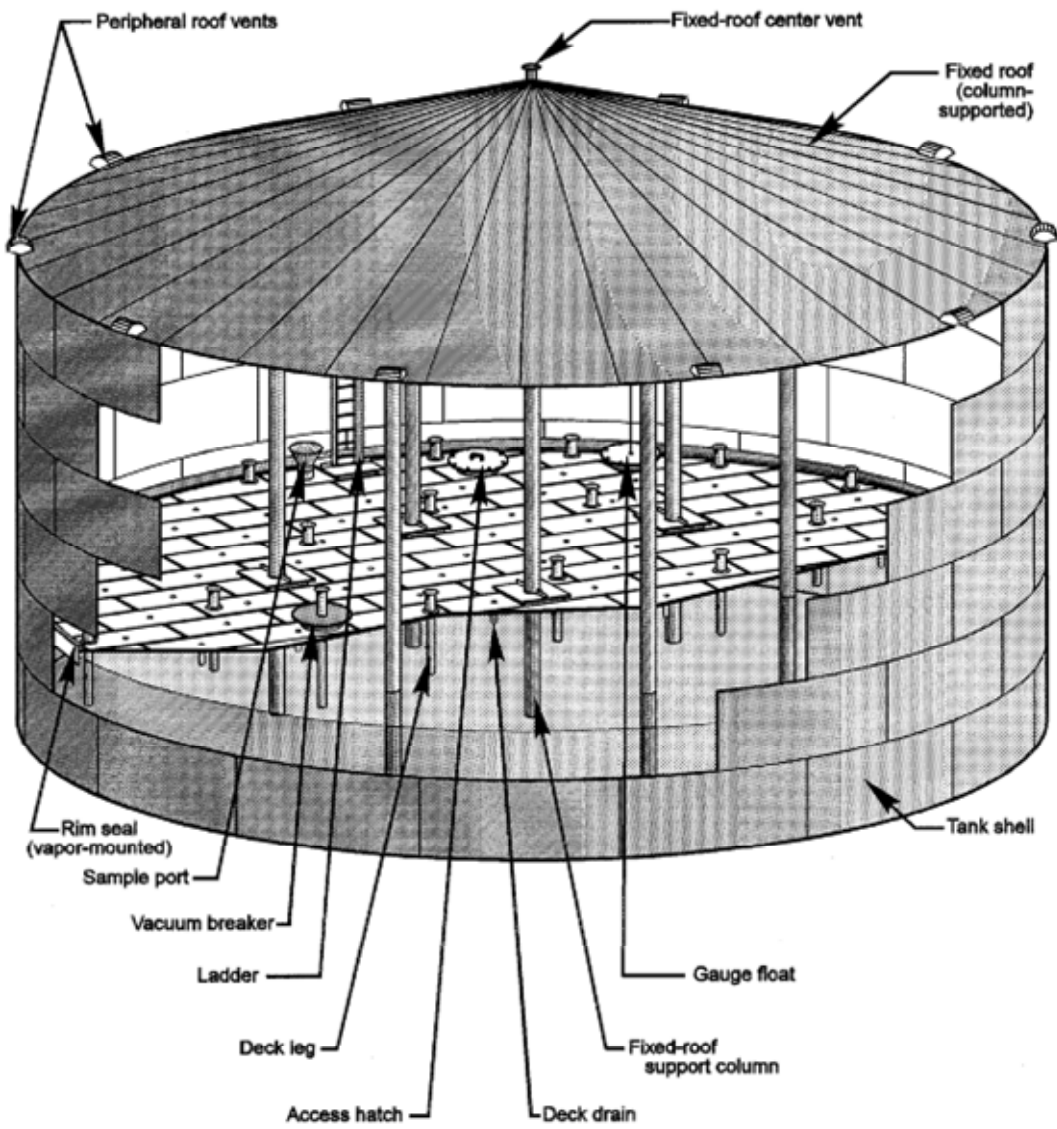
Internal floating roof tank.<sup>11</sup>
